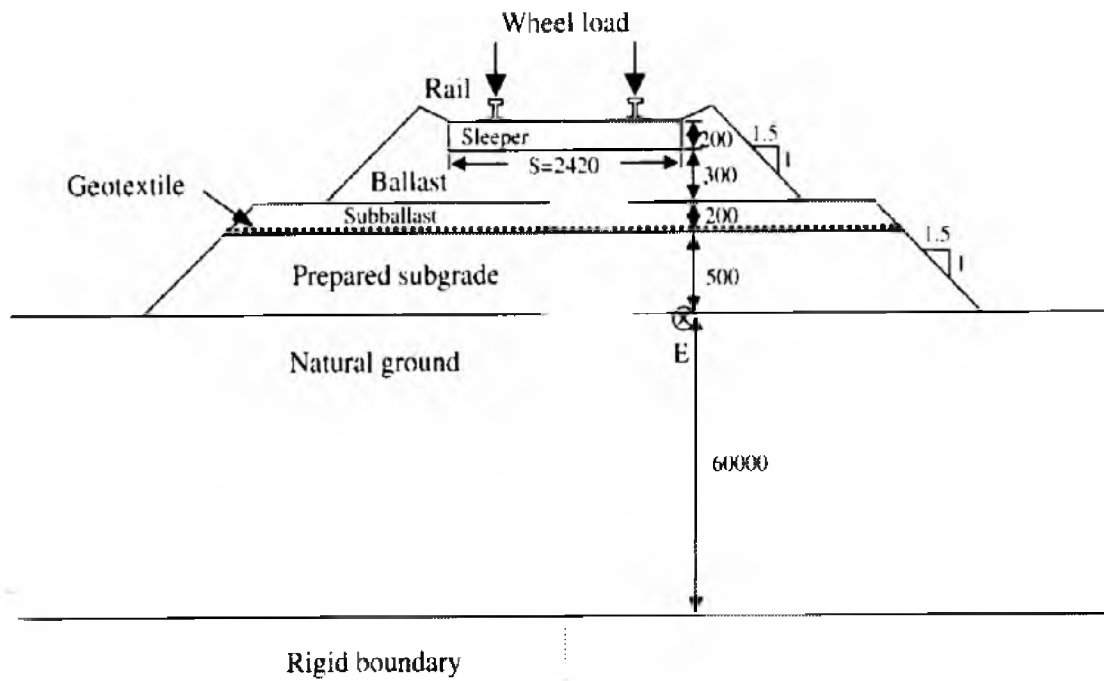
Schematic Cross-section of a Typical Track Structure (mm)
